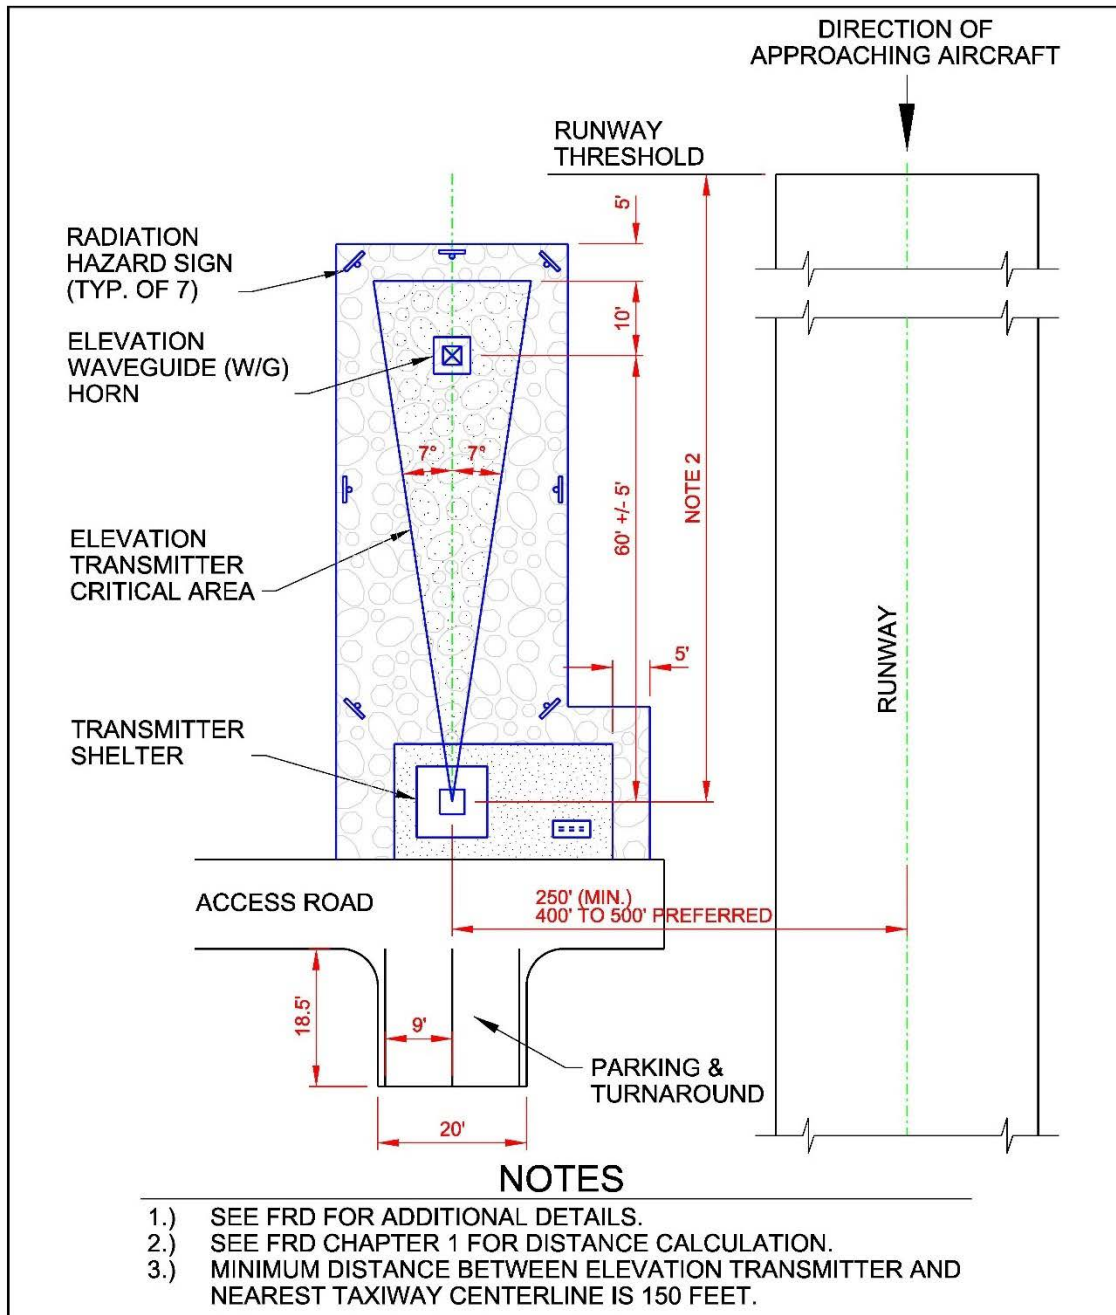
SBICLS Facility: Elevation Station Site Plan
